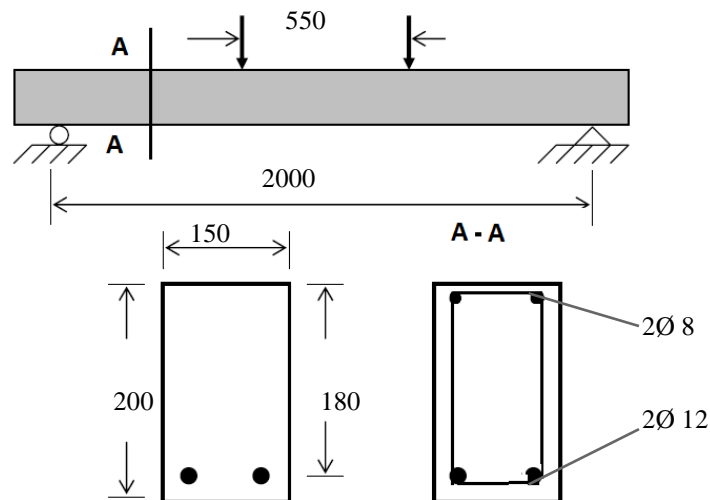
GFRP bars reinforcement and Beam Cross section
